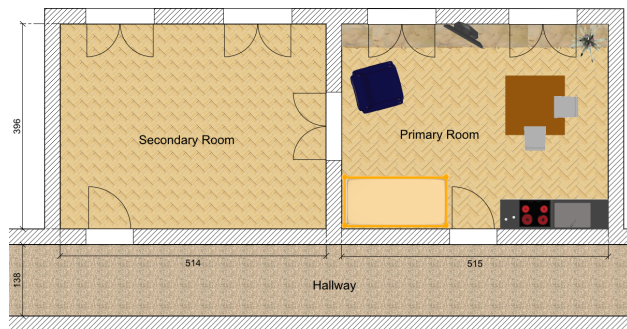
AAL laboratory's central primary room with areas for cooking, eating, living, sleeping and two adjacent rooms (secondary room and hallway)
